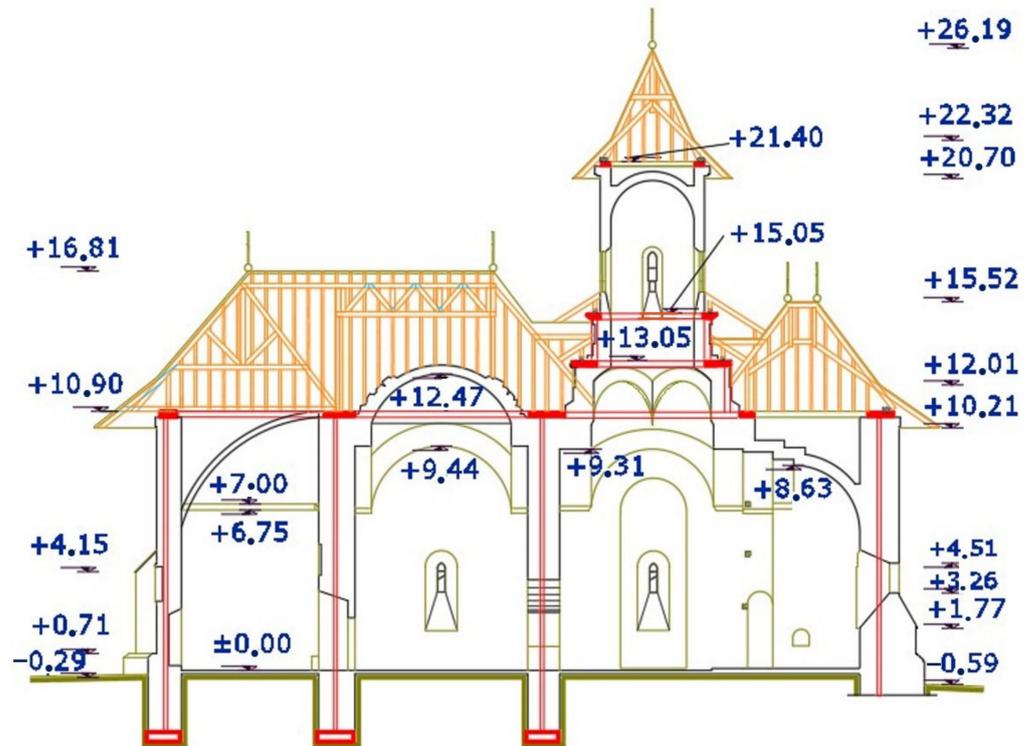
Position of the reinforced concrete girders (dimensions in m).
